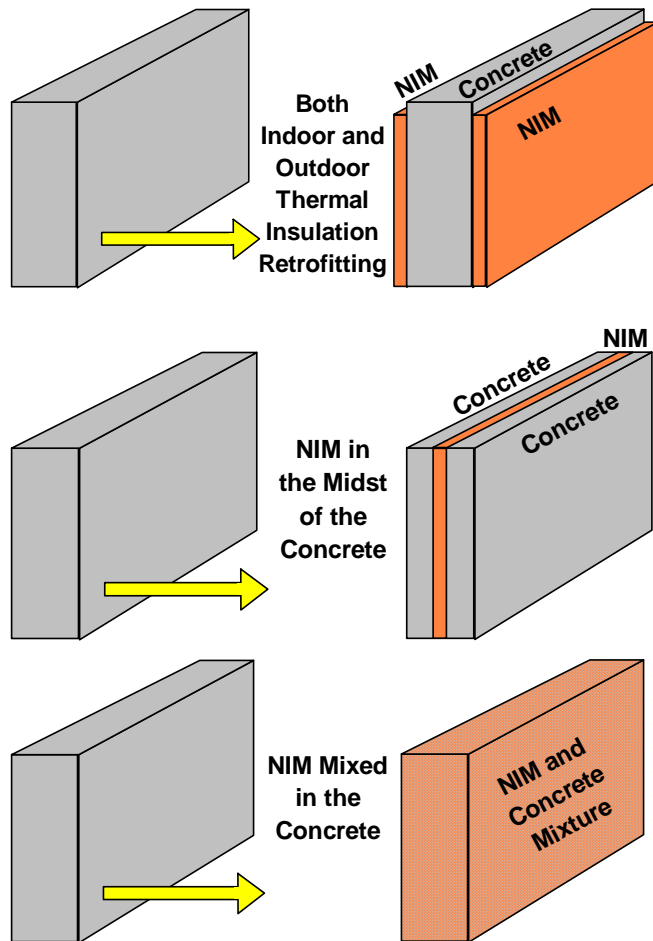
NIMs as thermal insulation for concrete, i.e. (top) NIM as outdoor and/or indoor retrofitting of concrete, (middle) NIM applied in the midst of concrete and (bottom) NIM mixed together with concrete.
